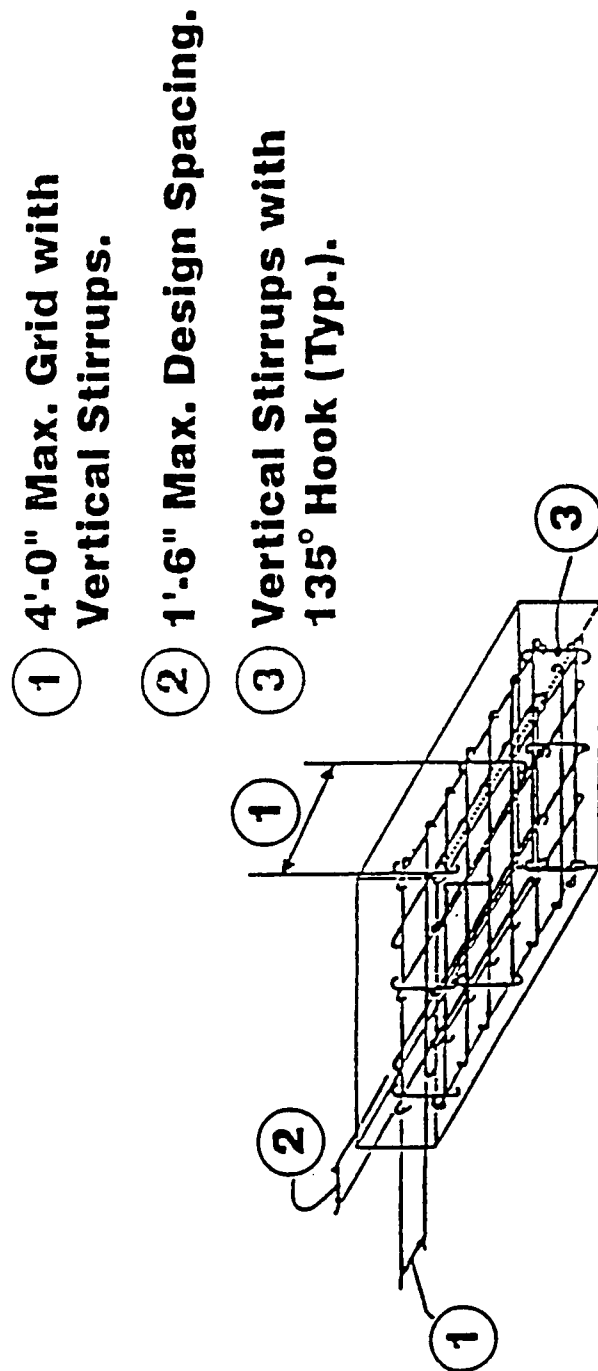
New York Column Bent with Continuous Footing - Cross Section
